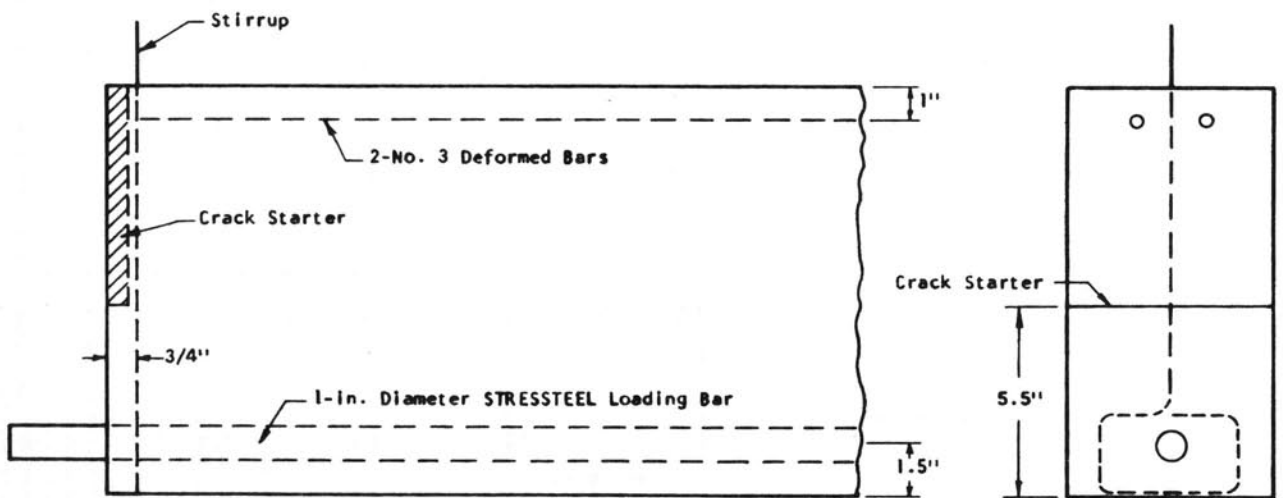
DETAILS OF THE REINFORCEMENT IN A BEAM
